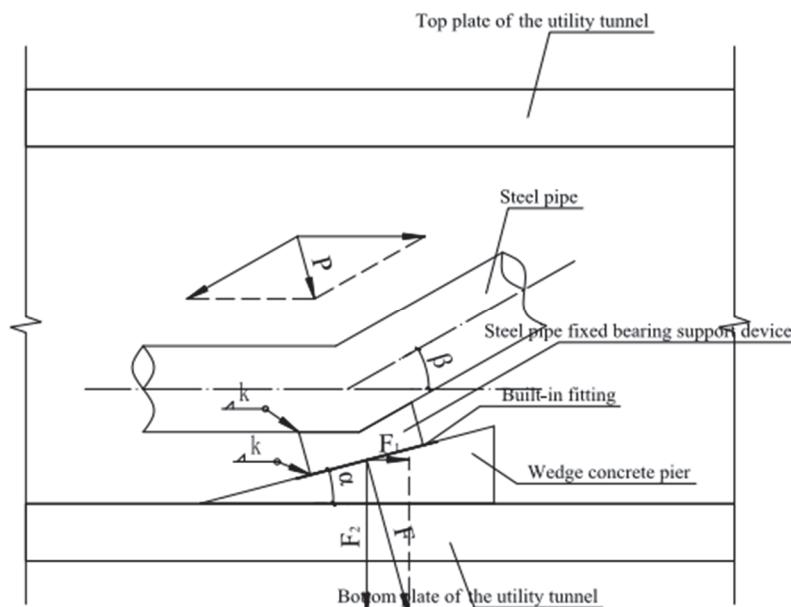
Structural design of wedge concrete fixed pier for pressure pipeline
